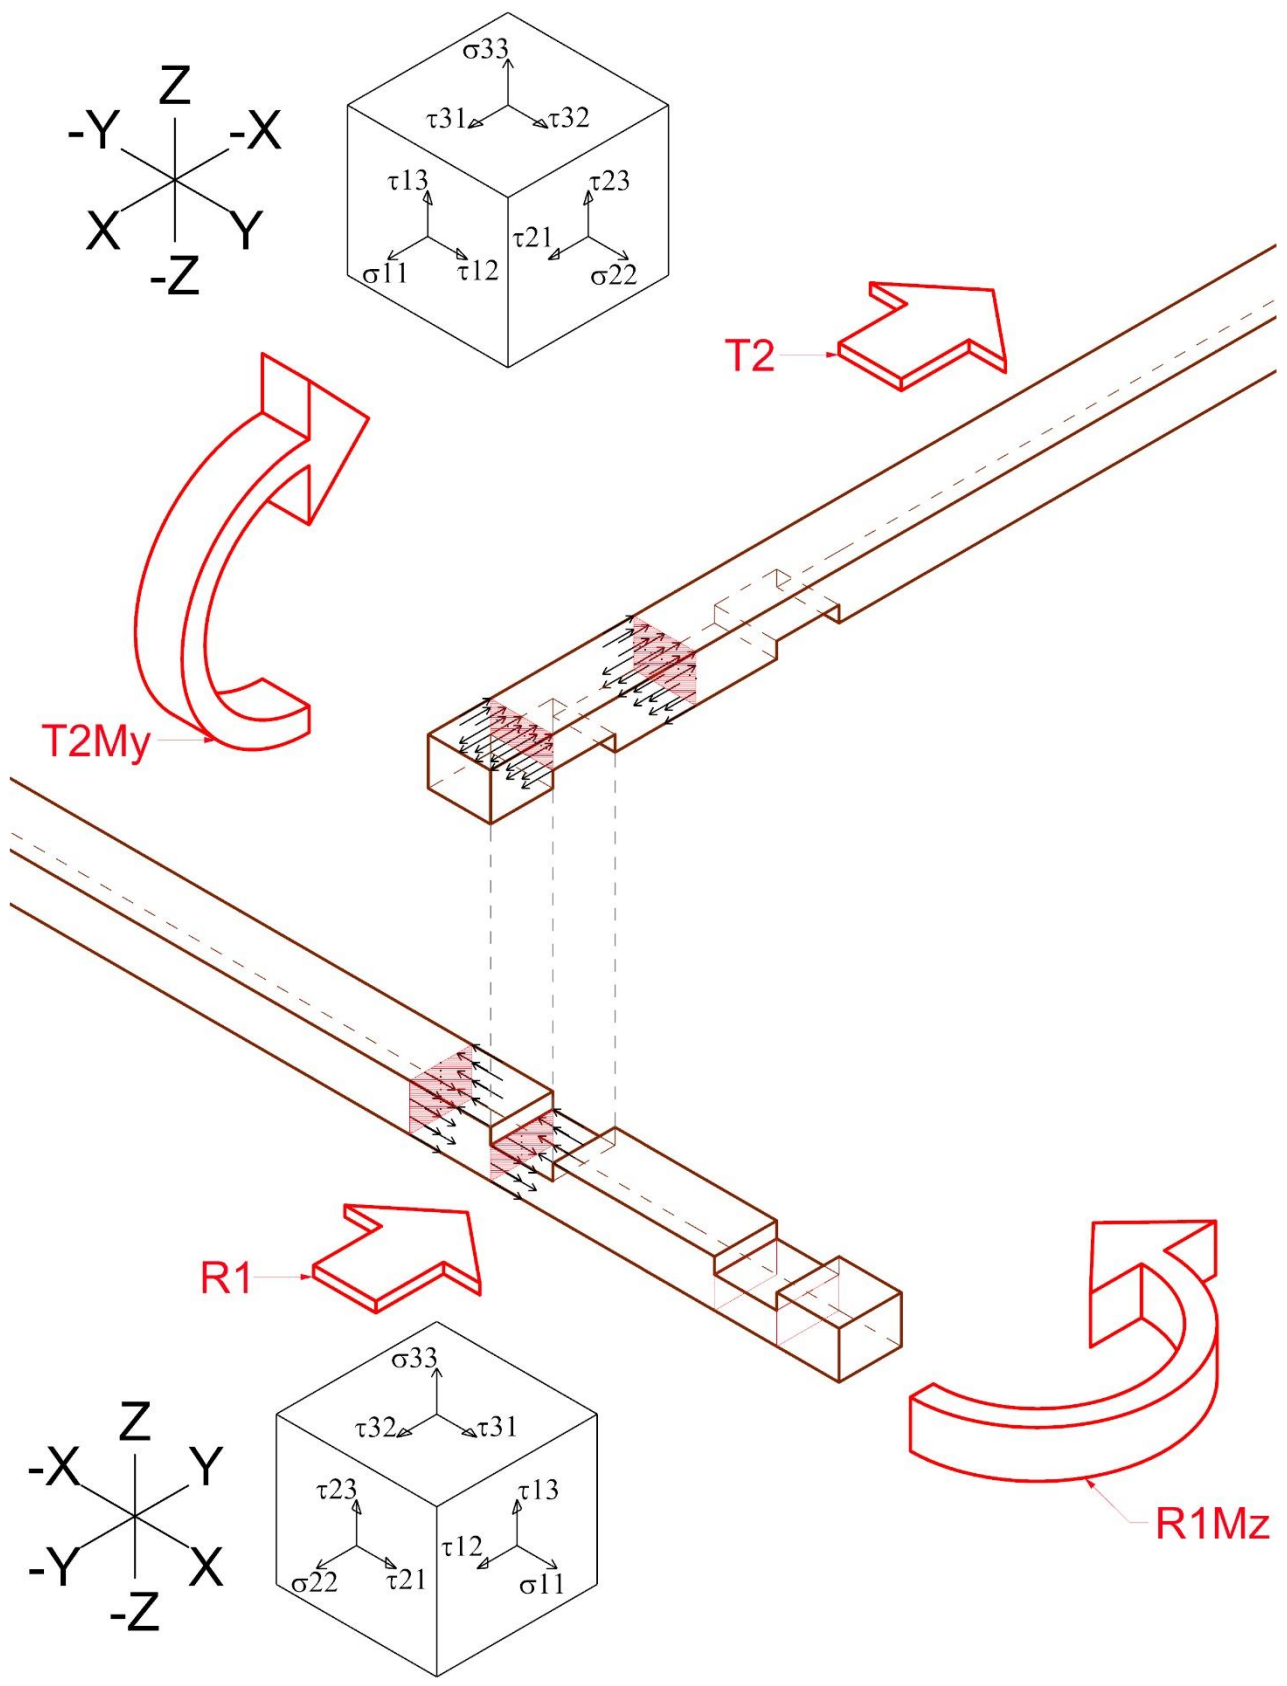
Rafter Head Bending moments: Axial stresses: Crossing rafters T2-R1
